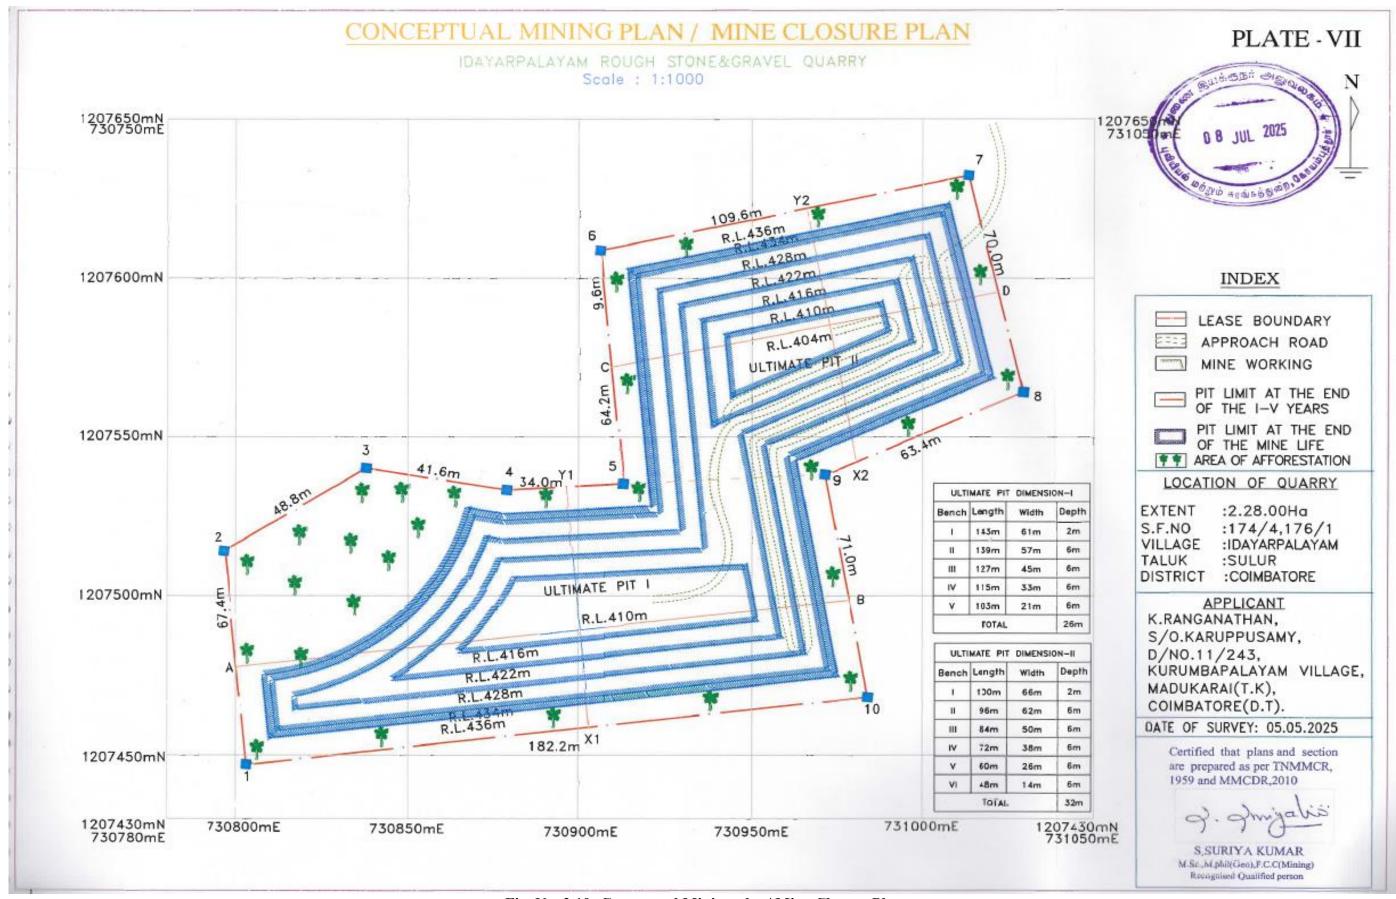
Conceptual Mining plan/ Mine Closure Plan
